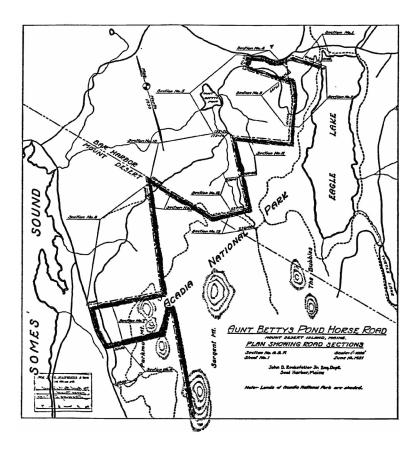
Key to plan and profile drawings for Aunt Betty's Pond Carriage Road, 1931. (Denver Service Center, eTIC, ACAD_123_80404_[id26712])
